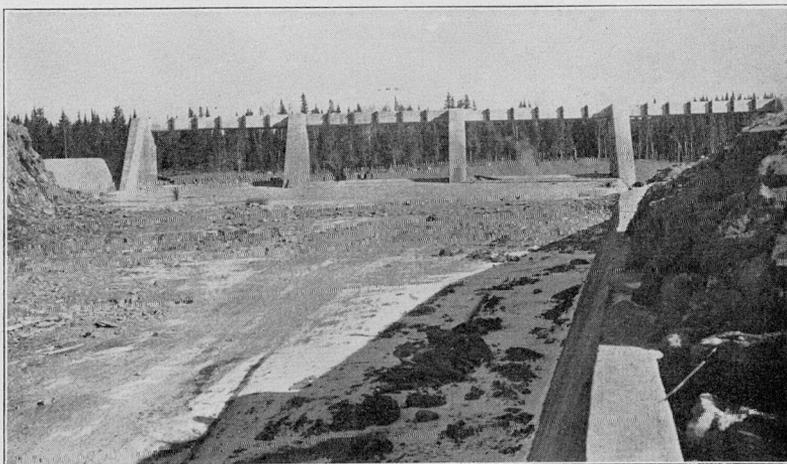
DOWNSTREAM VIEW OF SPILLWAY WITHOUT STANTIONS IN PLACE
